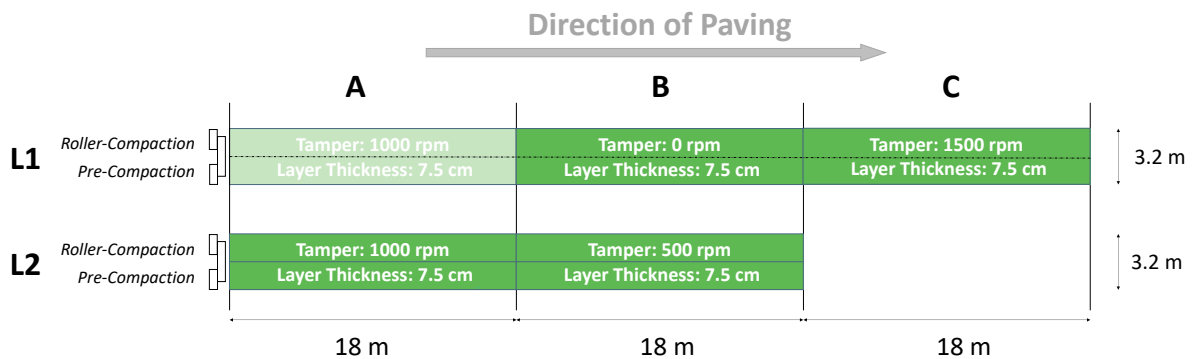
Construction plan of the test track in Bad Hersfeld, Germany
